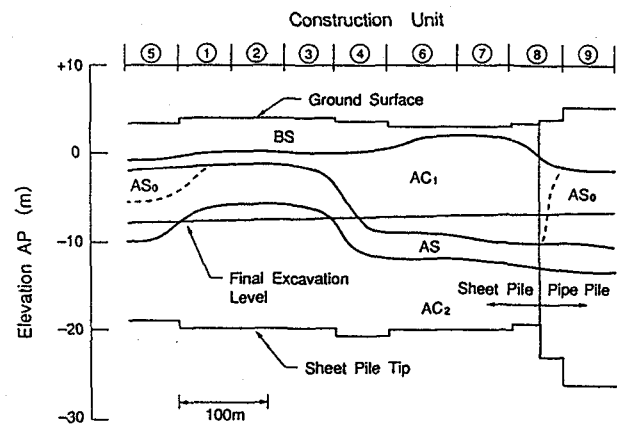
Soil Profile in Longitudinal Section and Layout of Construction Section (Tanaka et al., 1989)
